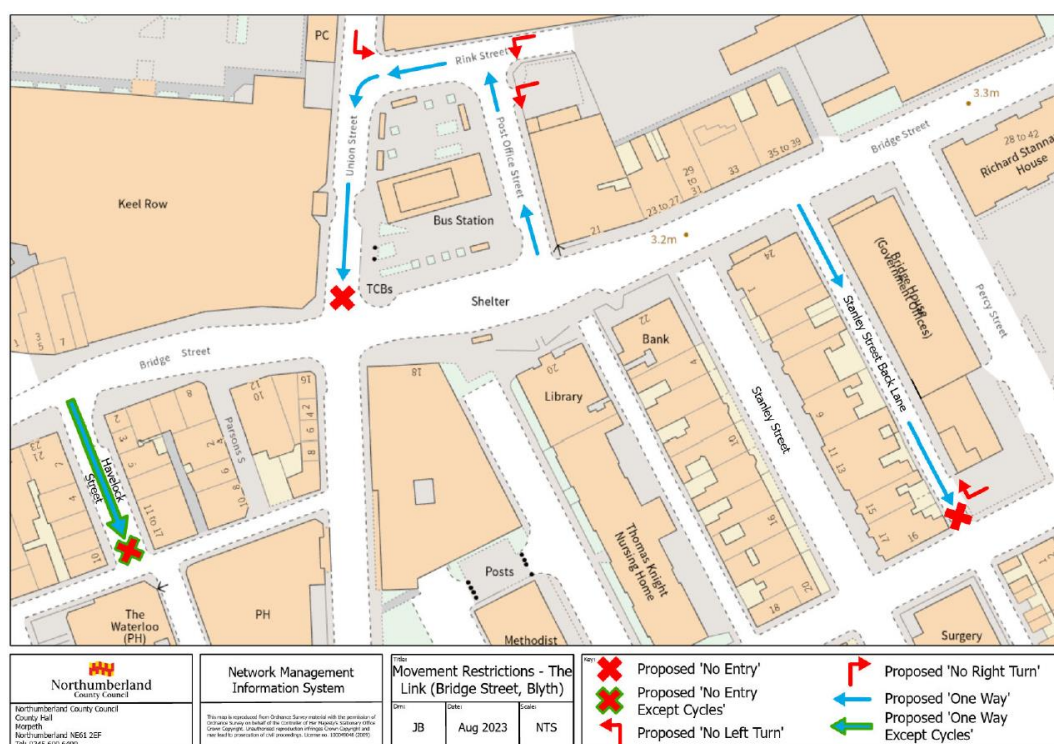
Proposed movement restrictions at Bridge Street and its adjoining roads
